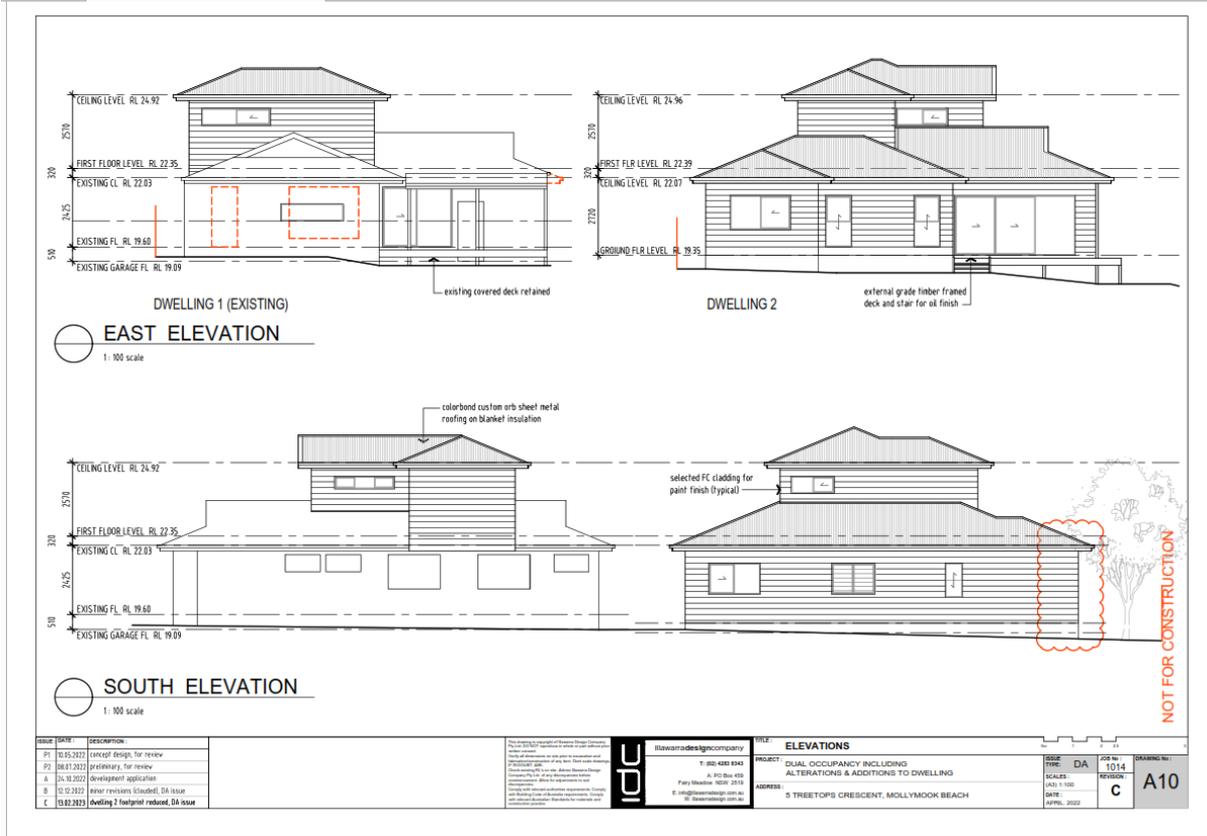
East & South Elevations – 5 Treetops Crescent Mollymook Beach
